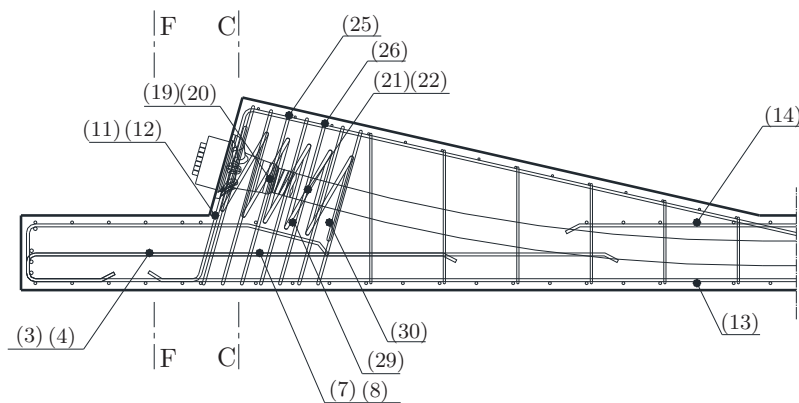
Strain gauges on the anchorage blister reinforcement (Section B-B)
